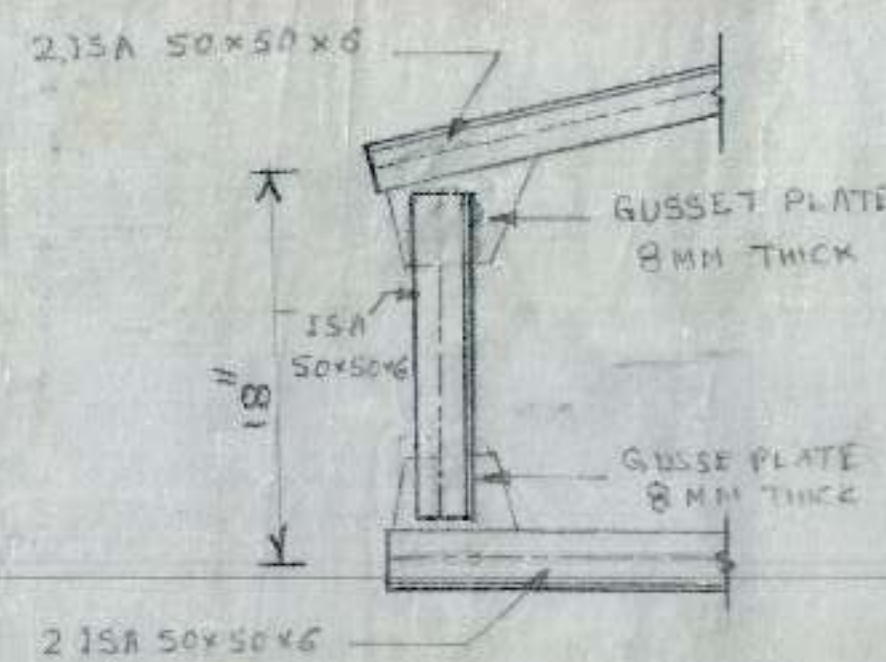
DETAIL AT-A (USE 6MM FILLET WELD)
